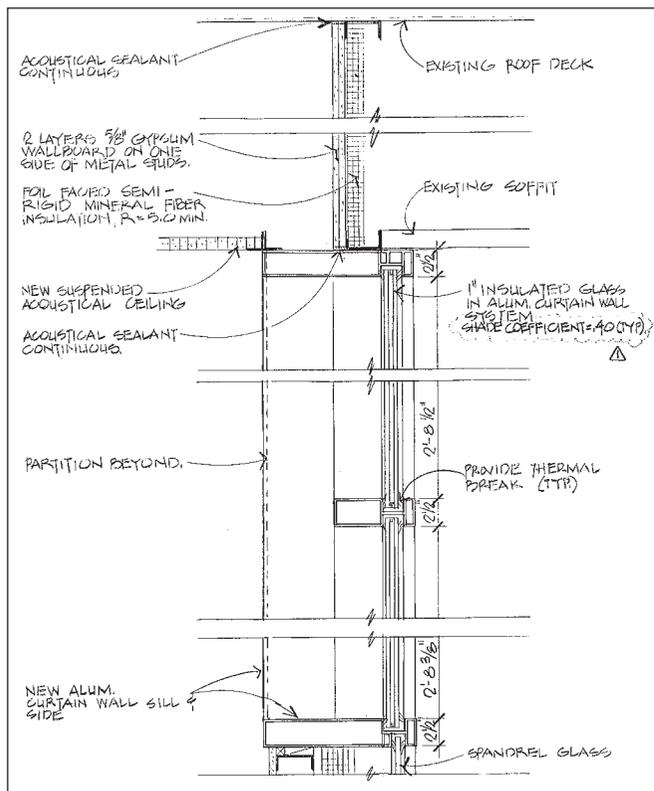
Soffit detail from architectural drawings for the 1991 renovation of the ASHRAE HQ building (Newcomb and Boyd).
